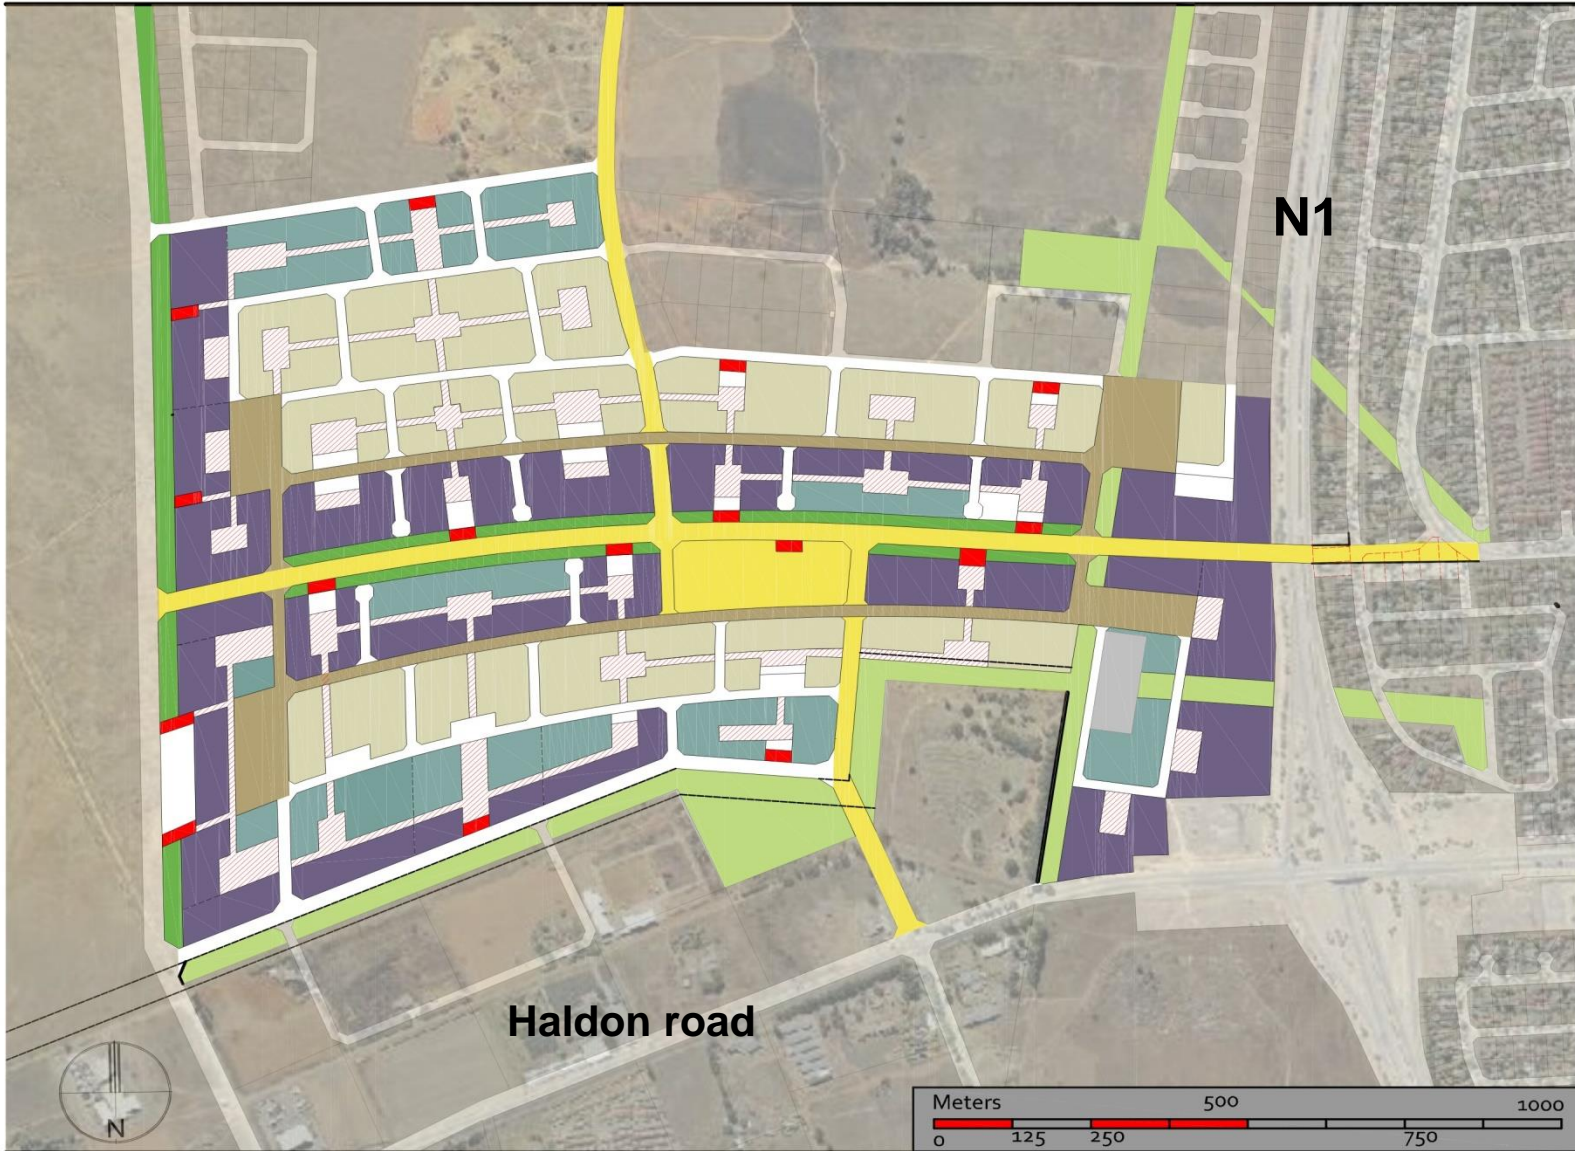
BRANDKOP 702 : ILLUSTRATIVE SITE PLAN
